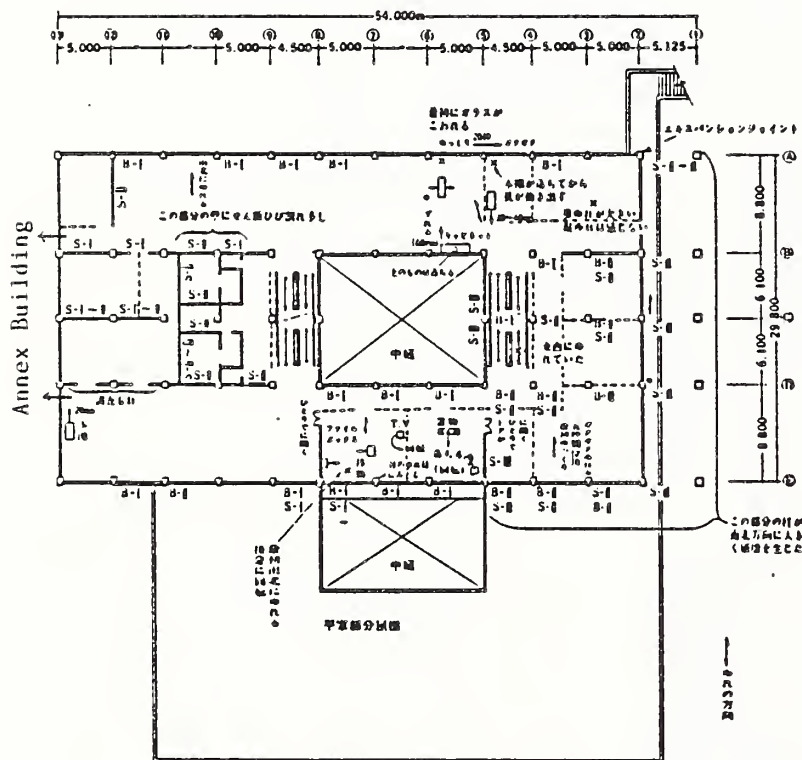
Second Floor Plan of Old City Office and the Damage in 1968 (Ref.4)
